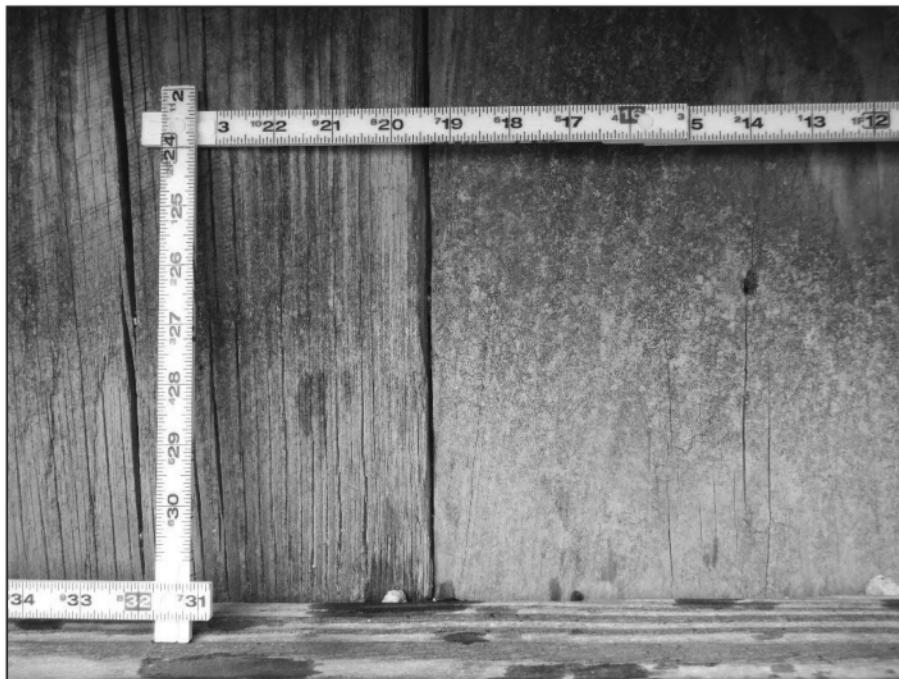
Typical Above Water Condition of 1987 Timber Sheeting (Sta 17+00 Shown)
